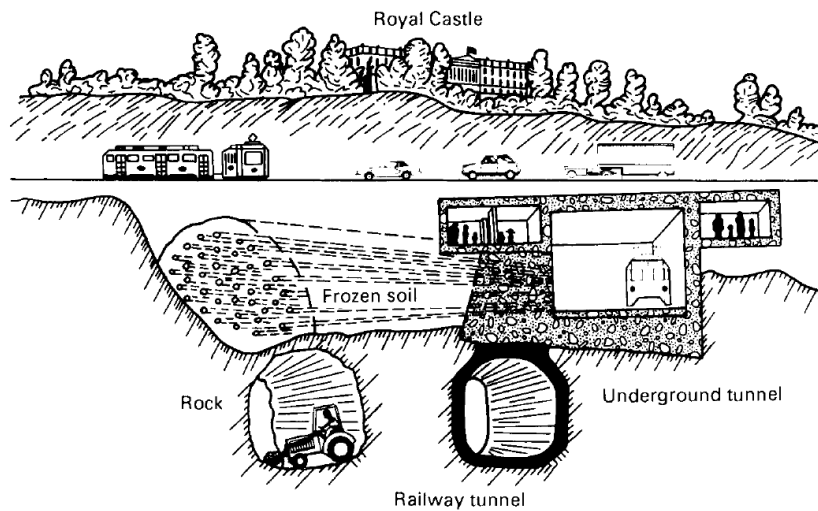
Cross section of tunnel systems (from Jøsang (1980))
